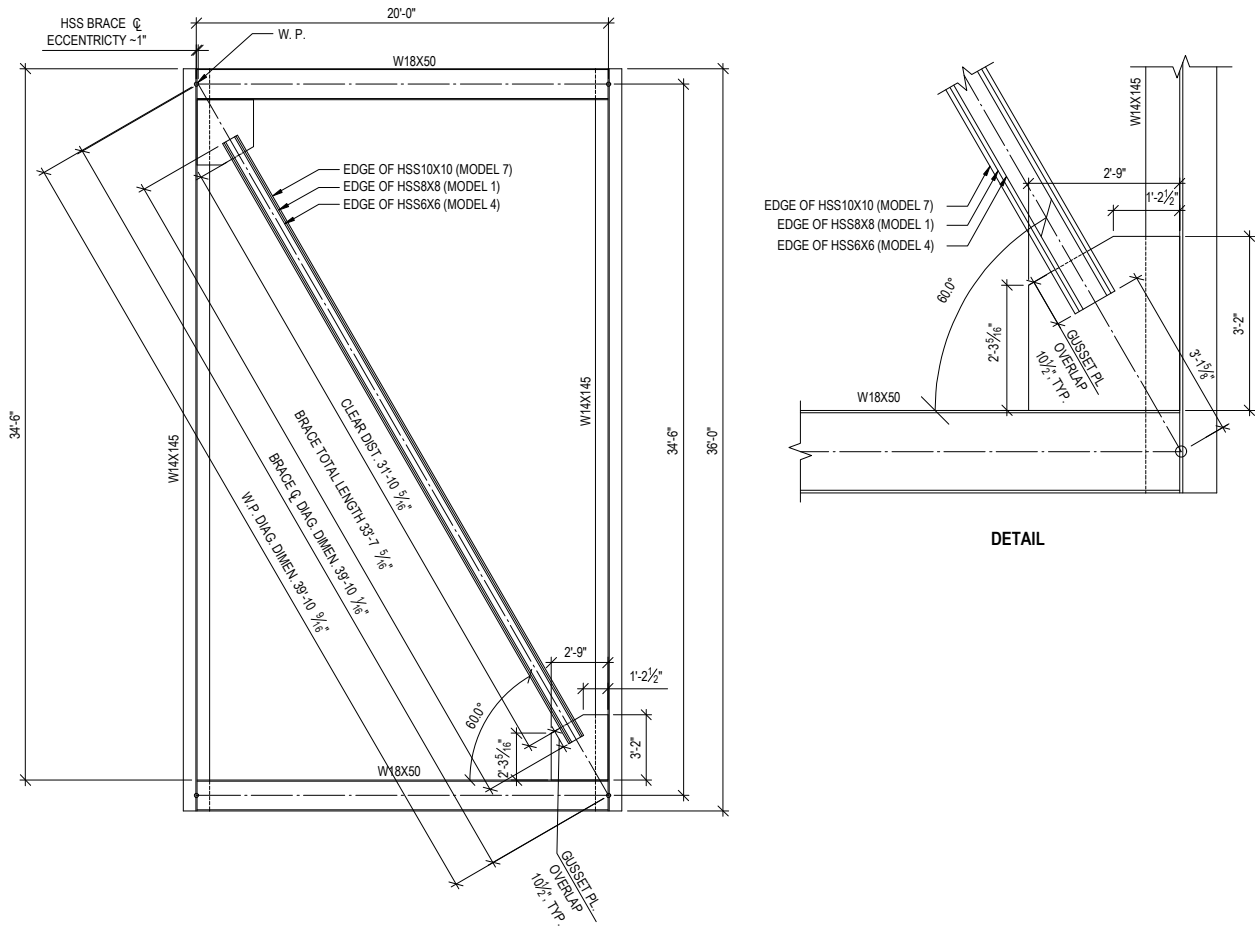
TALL Braced Frame and Gusset Plate Detailed Geometry
